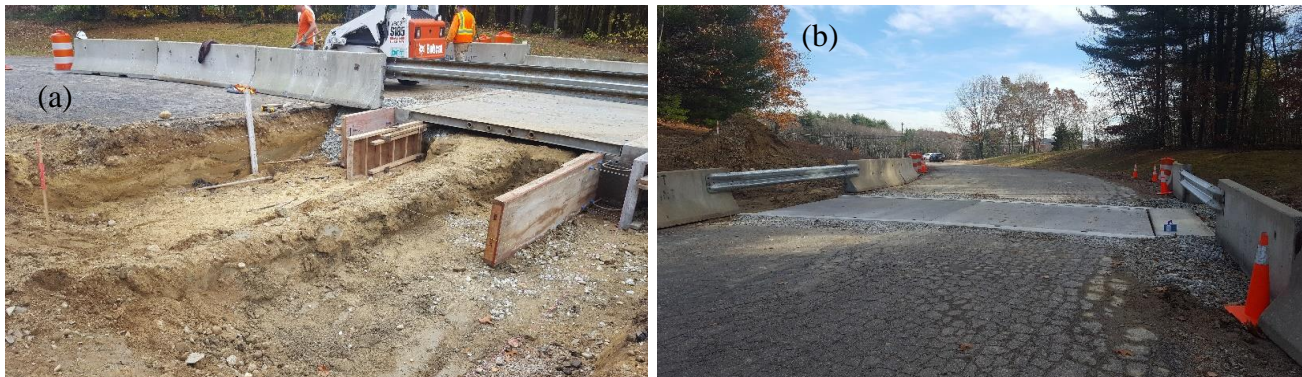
Construction of bridge at Newfields site for trafficking assessment of the high friction overlay system on Acrow bridge panel.
